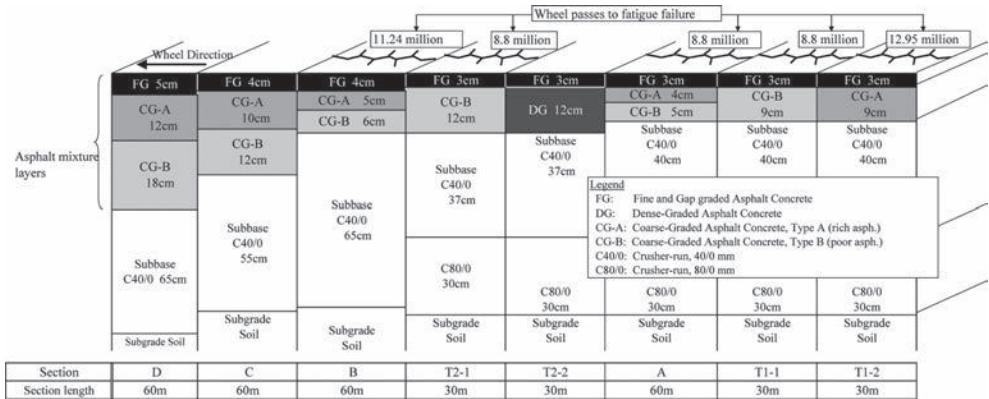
Pavement layer structures at Bibi New Test Road and fatigue failure conditions.
